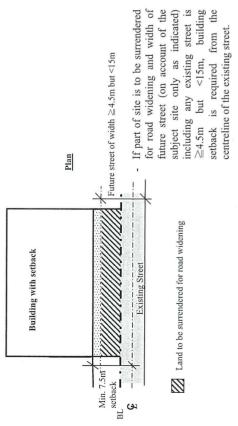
Example (2) of Building Setback – Portion of Site will be surrendered to form a future street
